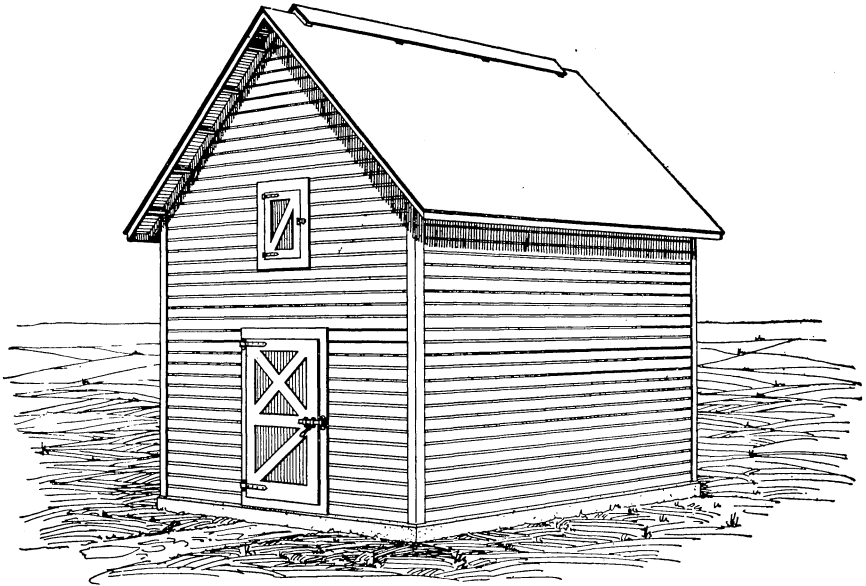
Wooden ice house, insulated with sawdust or mill shavings. (Perspective view.)
